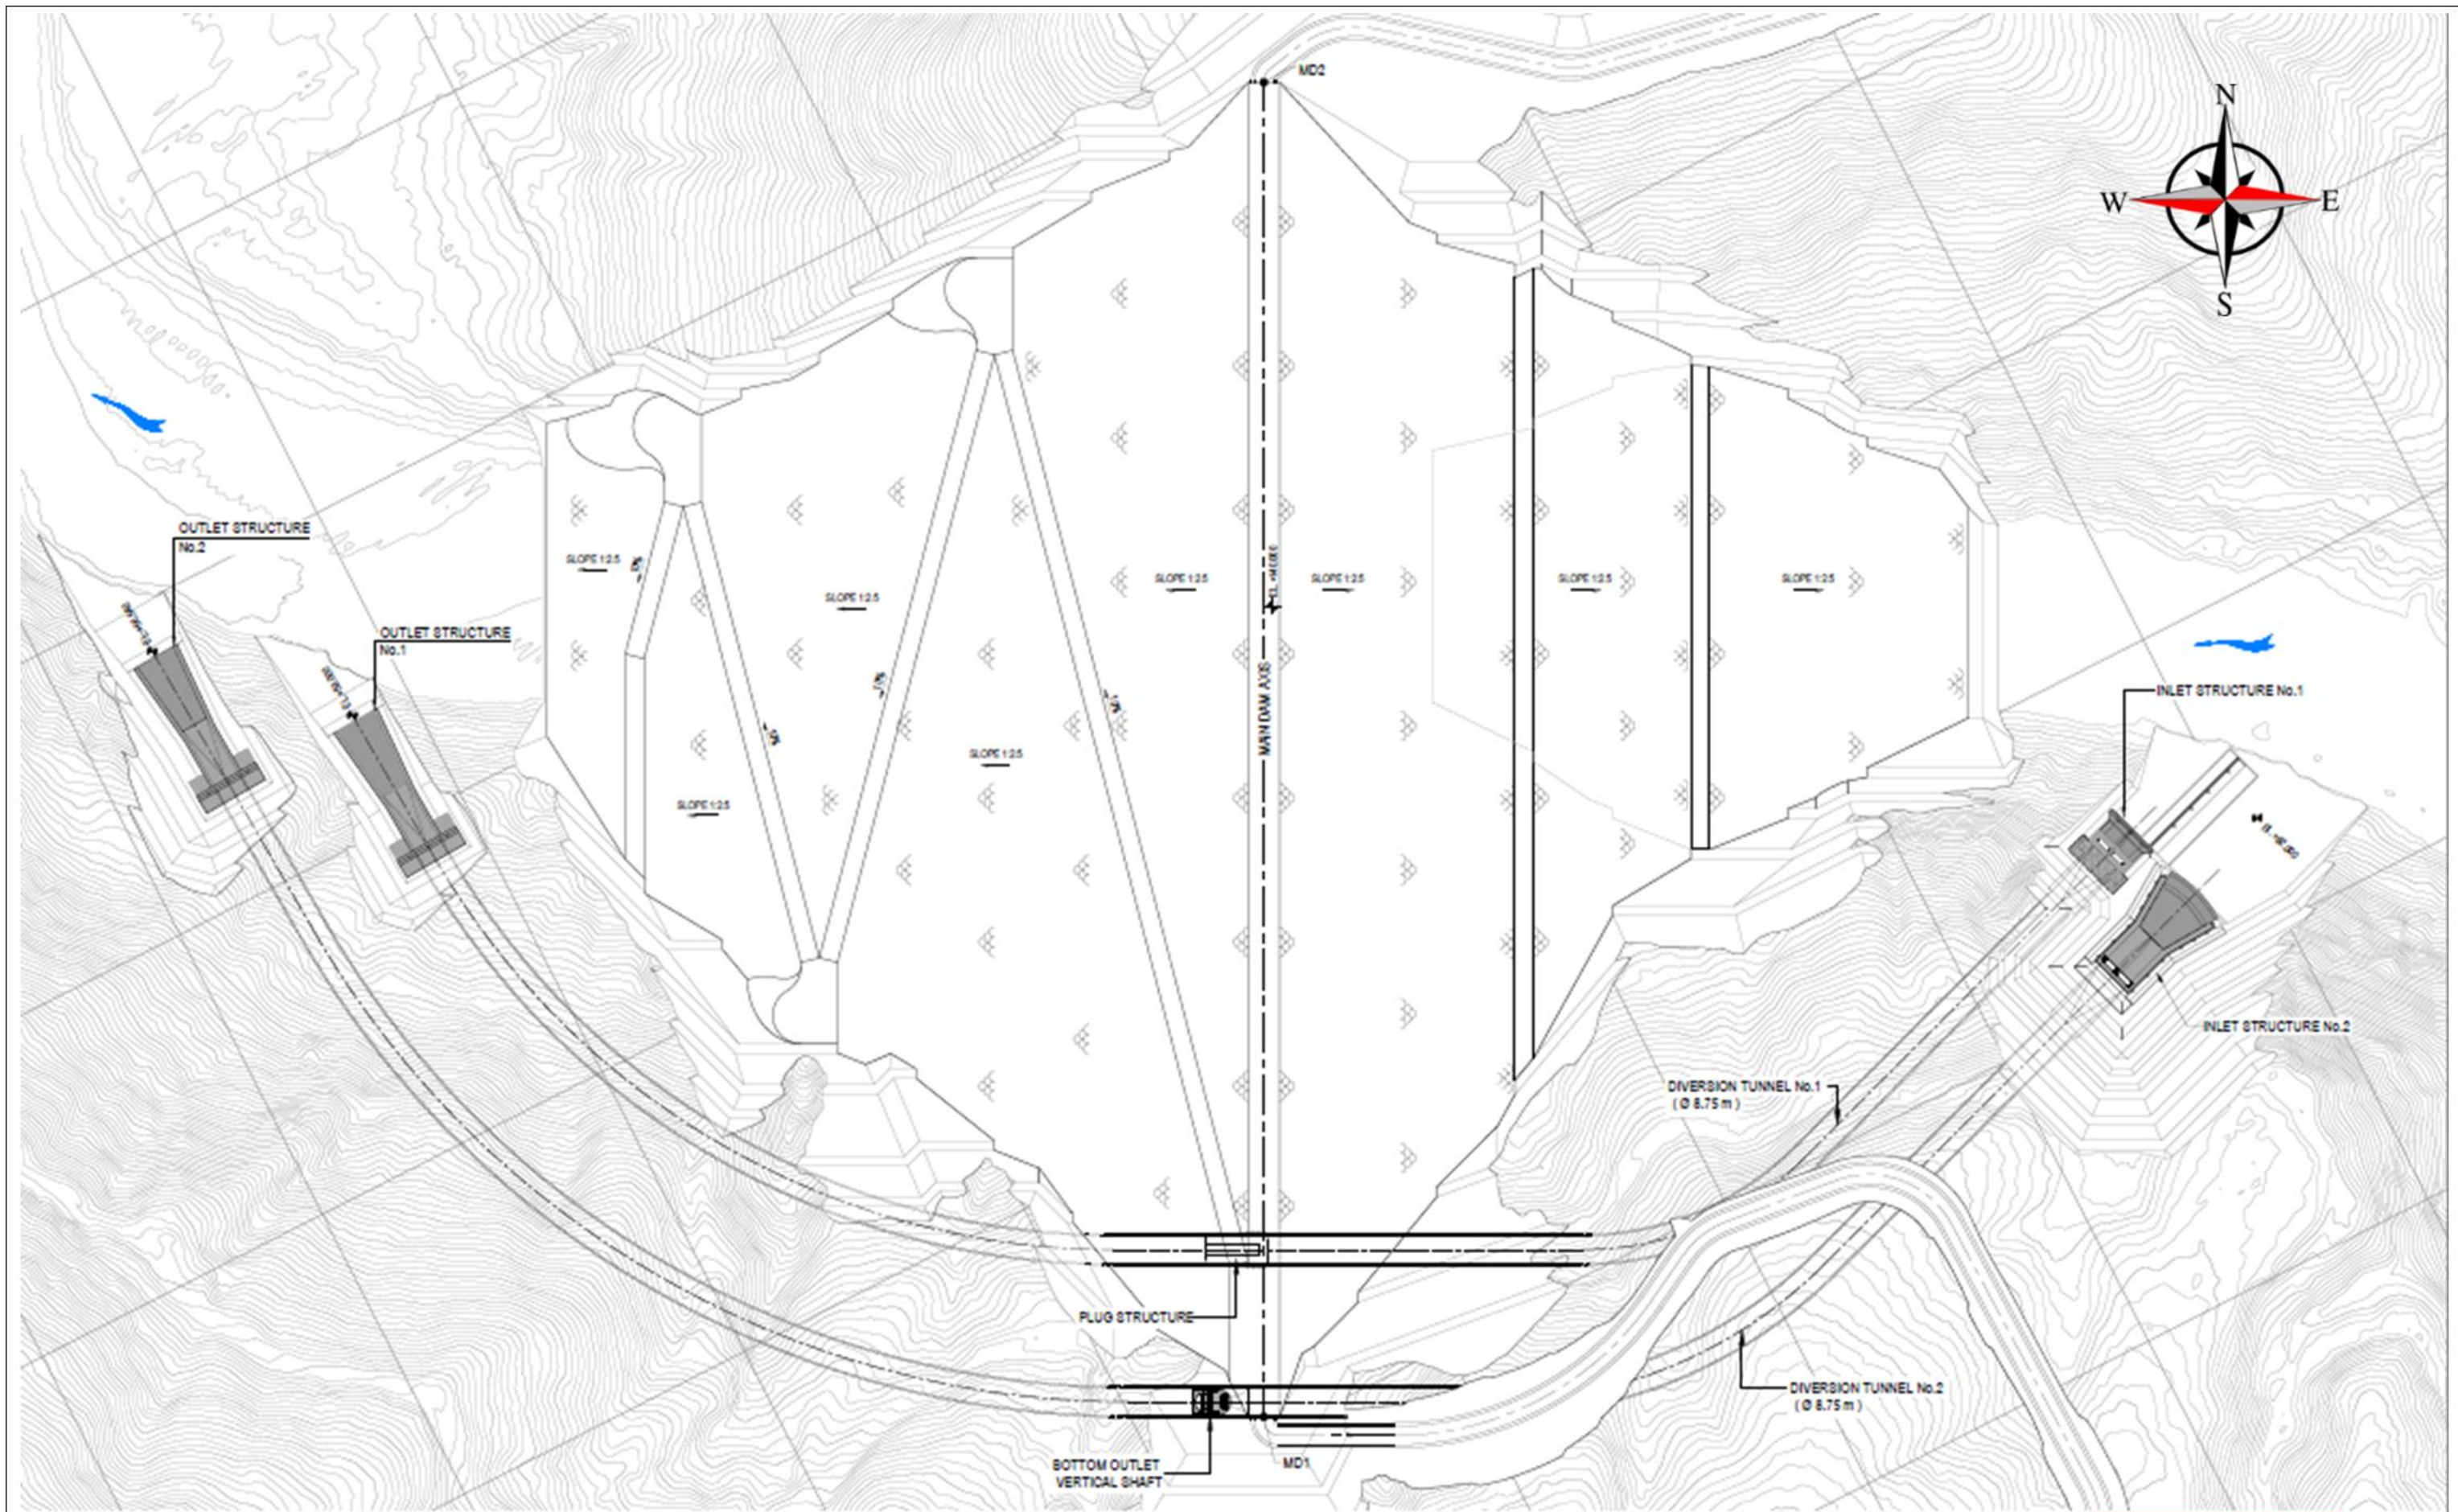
Plan view of Upper Wawa Dam and vicinity area.
